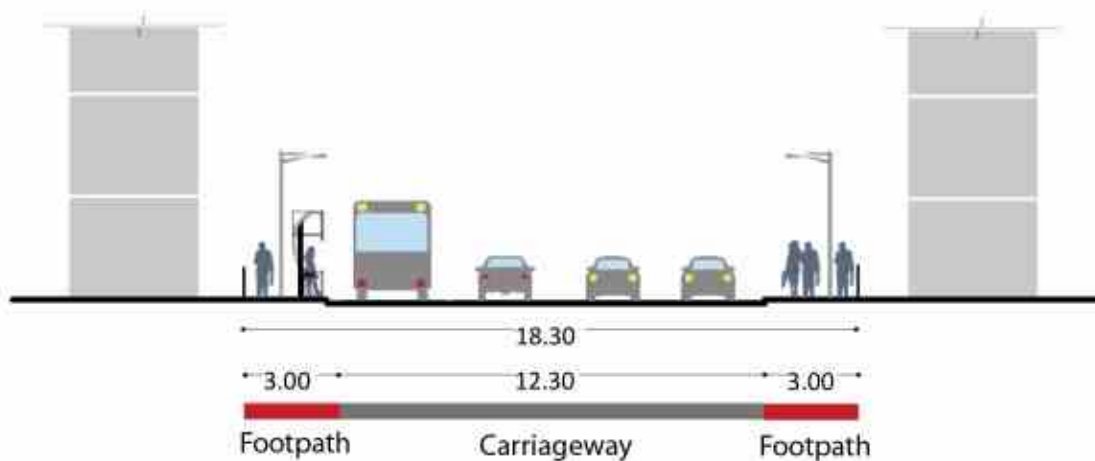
Allocation of Right of way for 18.30M Road (Alternative 2)
